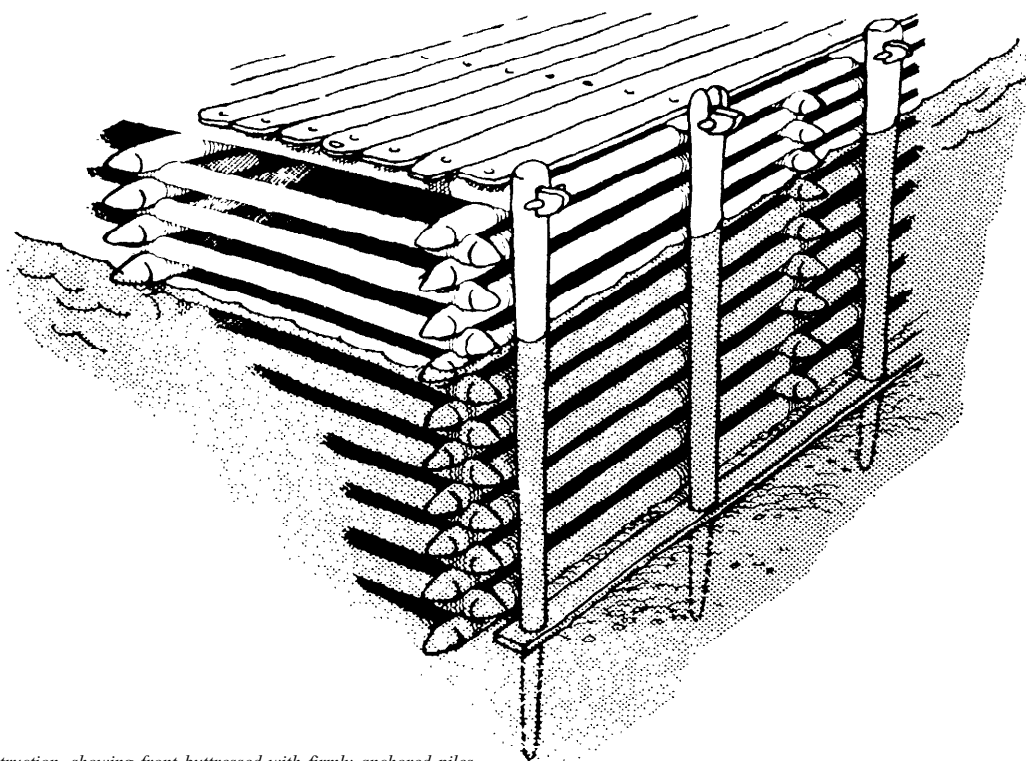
Bergen: detail of quay construction, showing front buttressed with firmly anchored piles
